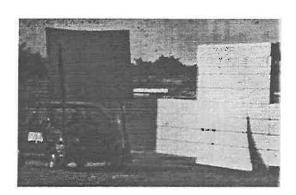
Sequential photographs for test 405231-19 (continued). (perpendicular and angular views)
